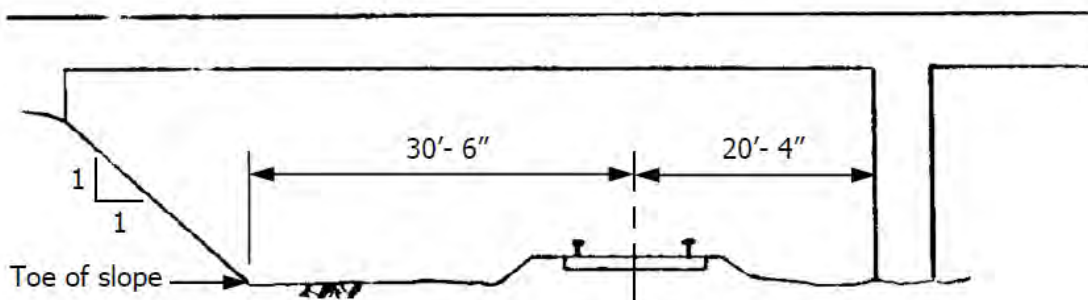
Bridge elevation view with one railroad track below the bridge (Example 1)
